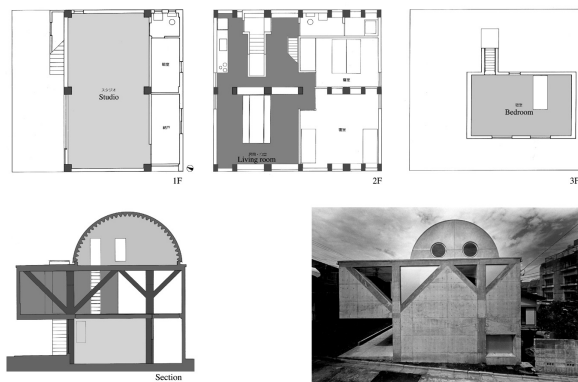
Shinohara Kazuo, House in Uehara street, Tokyo, 1976. Main façade (photograph ©Taki Kōji 多木浩二), plans and section adapted by the author.
